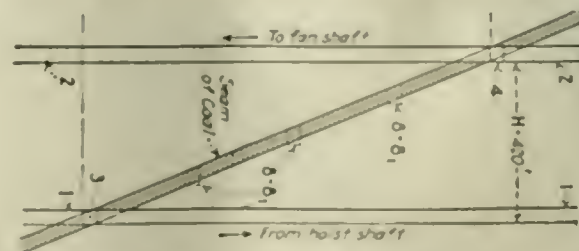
ELEVATION OF TUNNELS AND COAL SEAM
